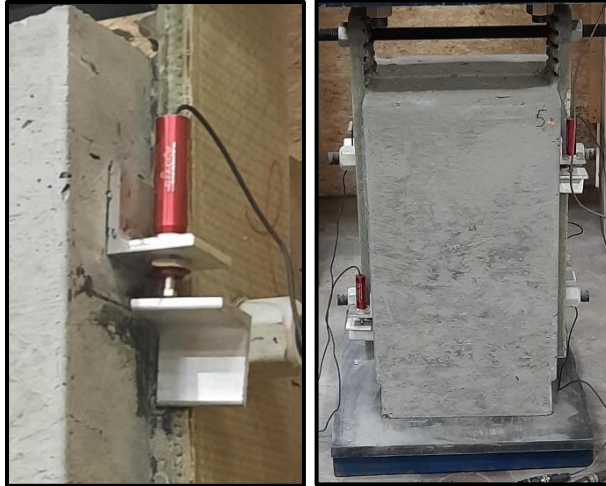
Linear Position Sensor (Left); Test Setup (Right)
